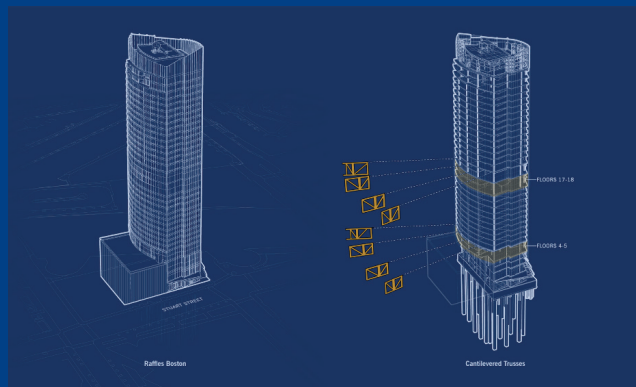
Structural diagram of Raffles Boston shows trusses for cantilevers at floors 4-5 and 17-18.
